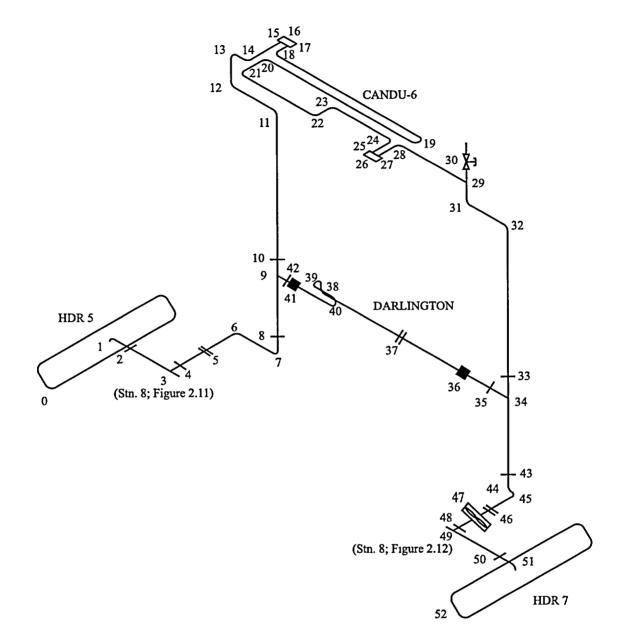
Elevation Diagram for Outlet Header Interconnects
